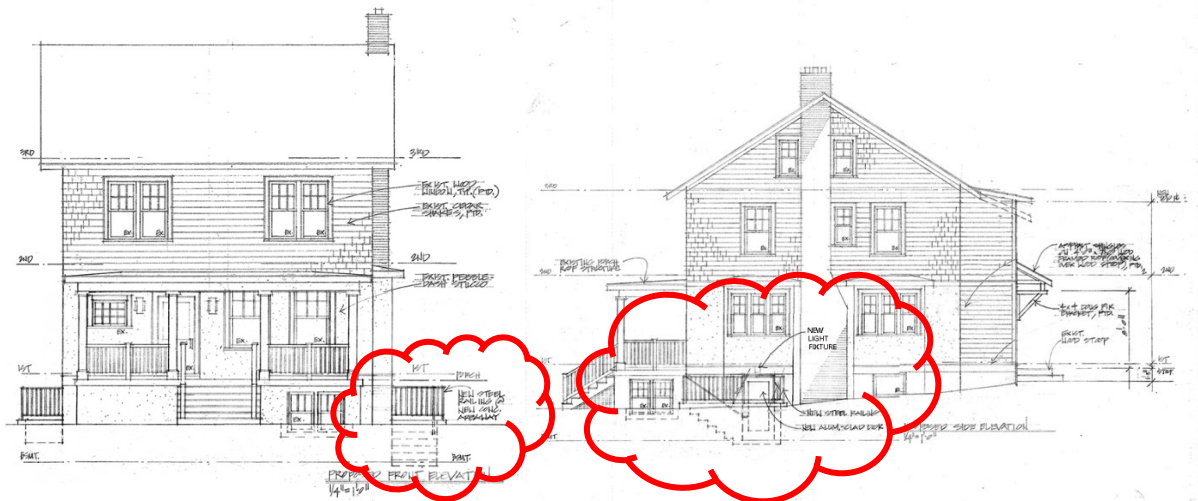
The proposed areaway and railing is shown on the front and right-side elevations.
